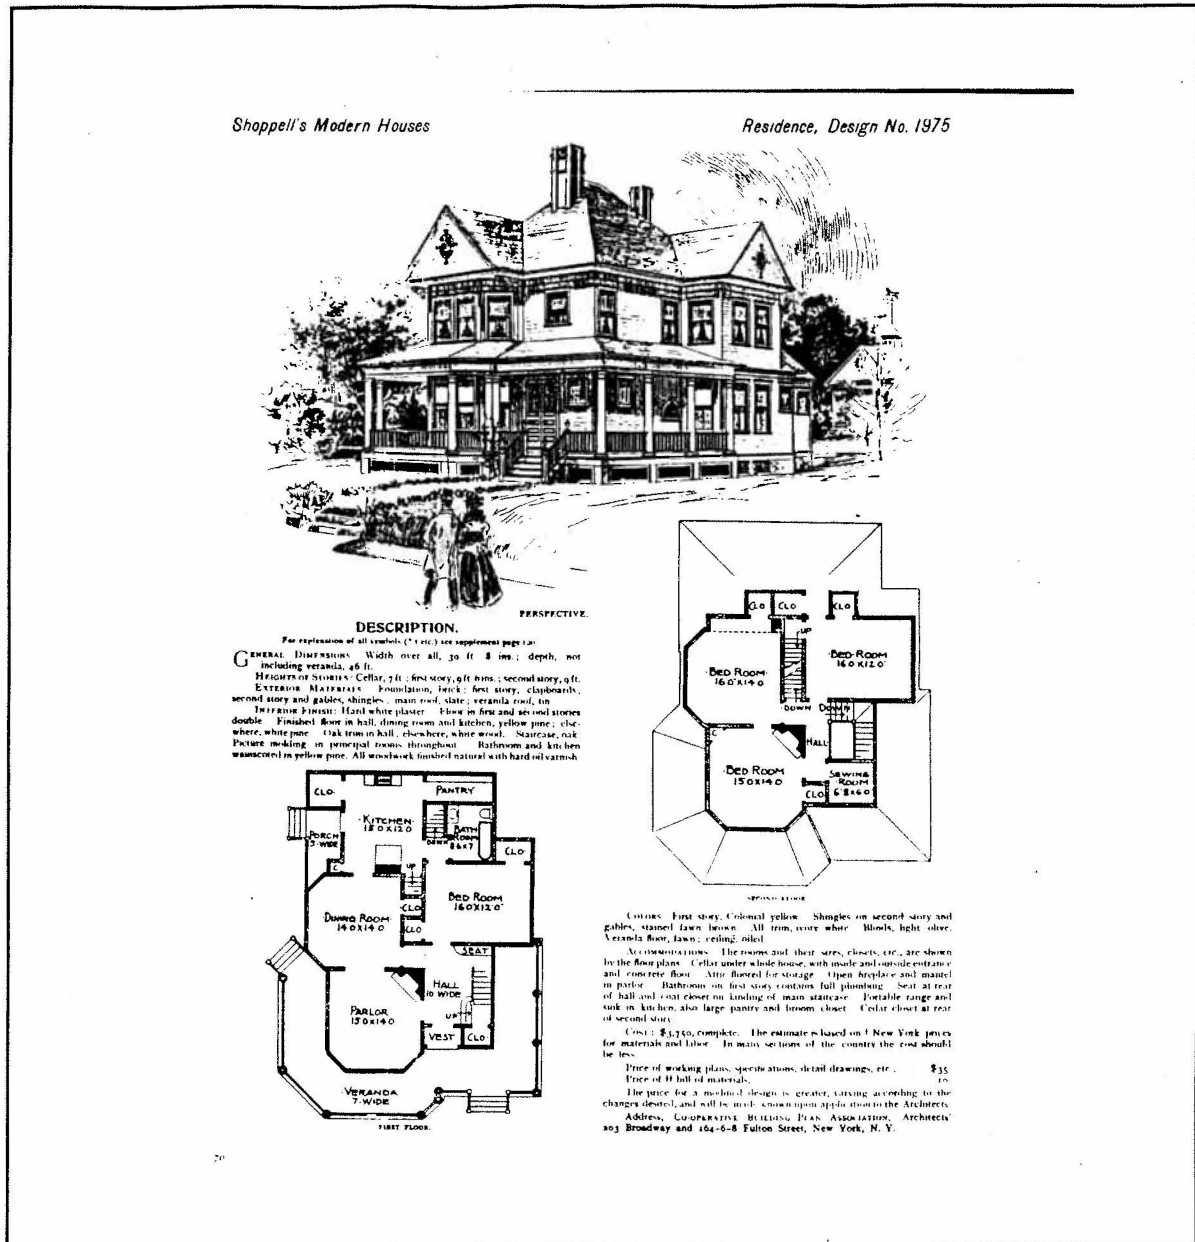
Illustration from Shoppell's Modern Houses, Design No. 1975.
